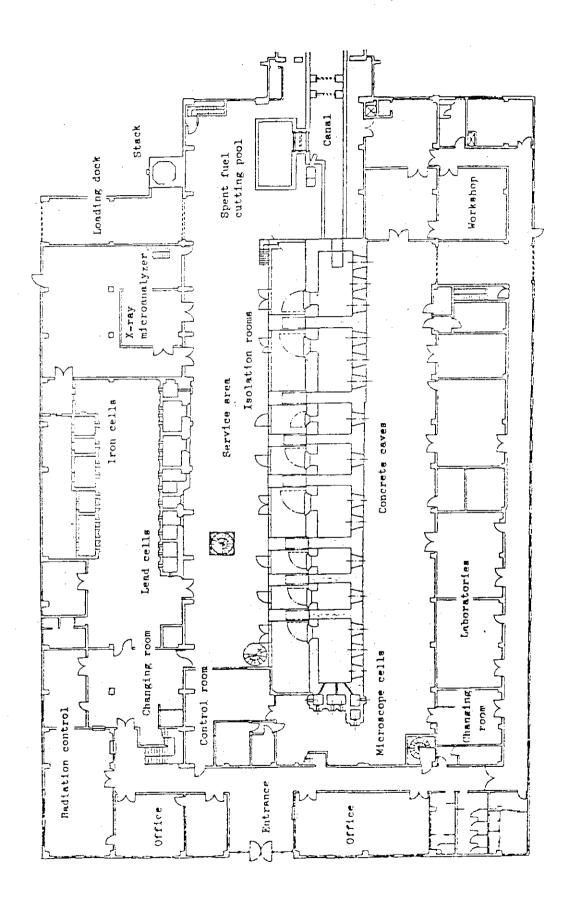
Floor Plan of the Hot Laboratory
